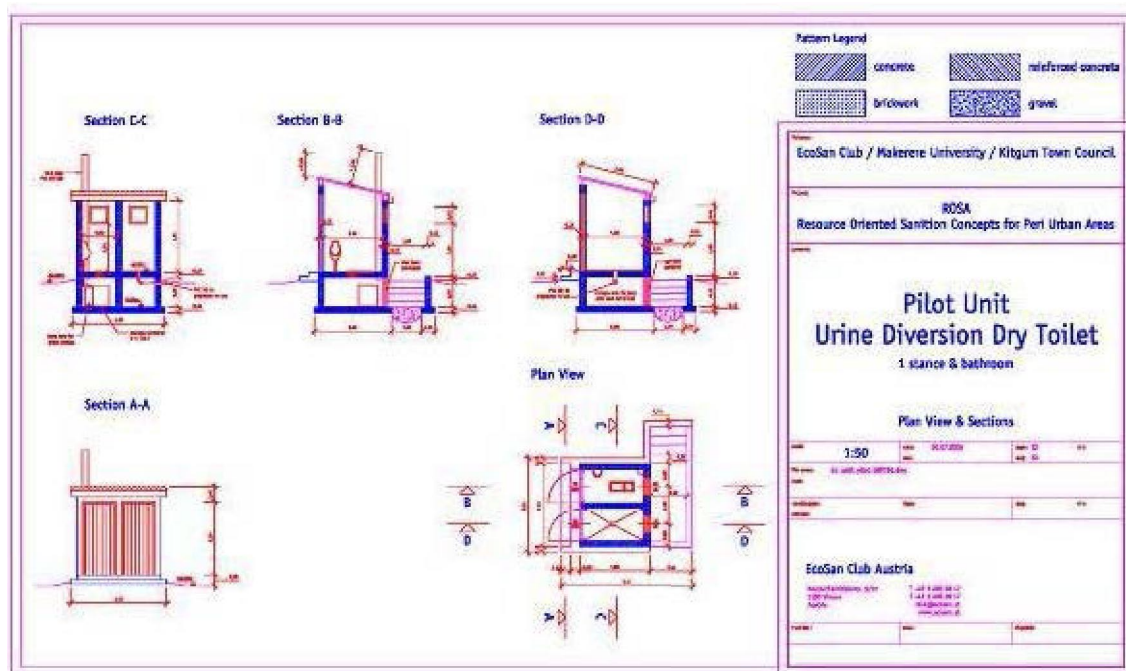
Floor plan of one stance UDDT (ROSA Kitgum, 2009)
